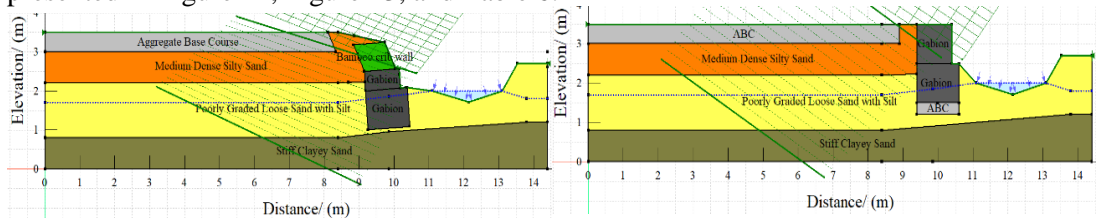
Models of Bioengineered retaining wall and Gabion wall
